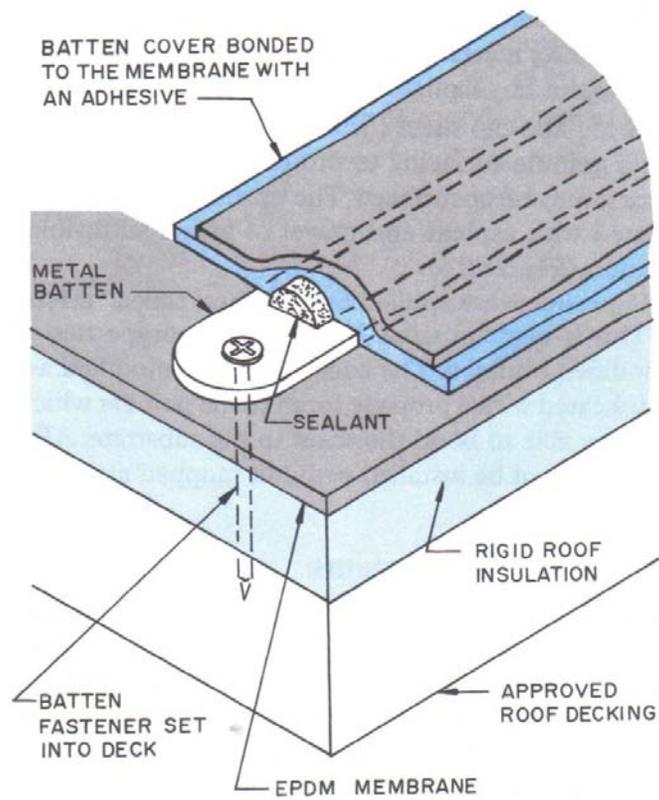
Mechanically fastened single-ply roof system detail (Spence, 1998)
